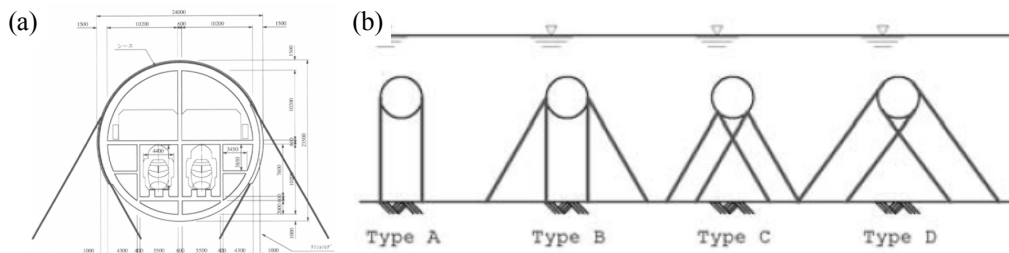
SFT crossing Funka Bay (Japan; Kanie, 2010): (a) tunnel cross-section; (b) proposed cable groups arrangement.
